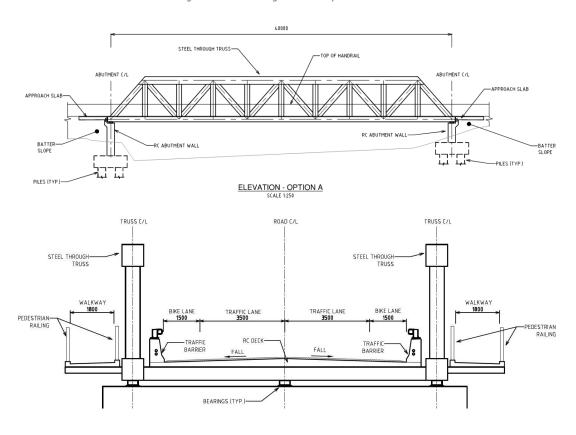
Edwards Bridge Renewal: Option A – Typical elevation and section
